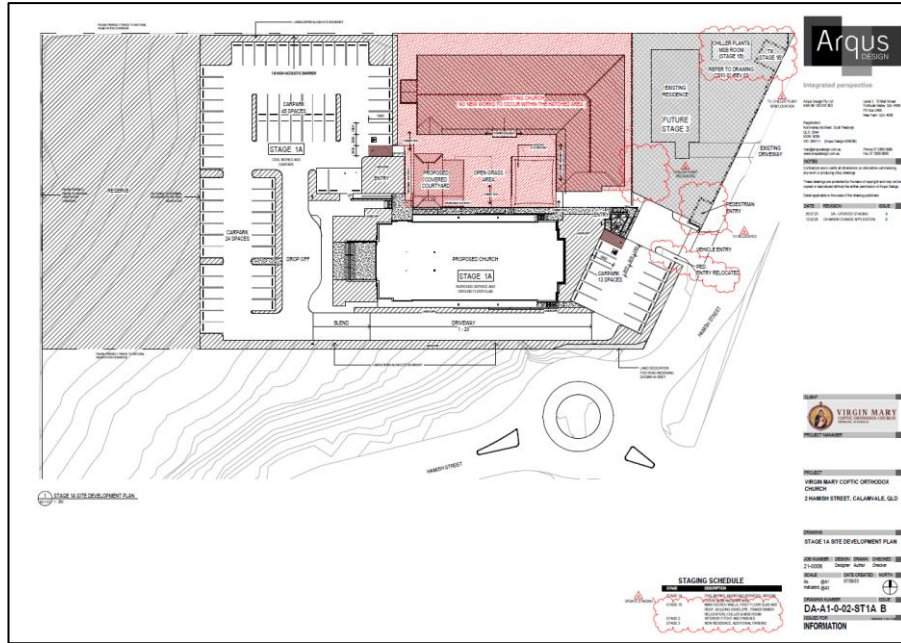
Proposed Stage 1A Plan Issue D – Arqus Design (12 February 2026)
